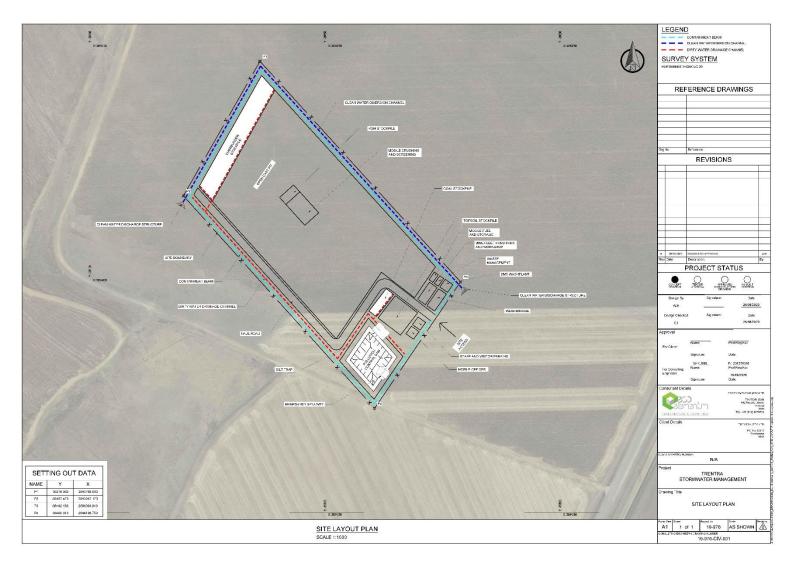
Proposed site layout (Adapted from Eco Elementum 2020).
